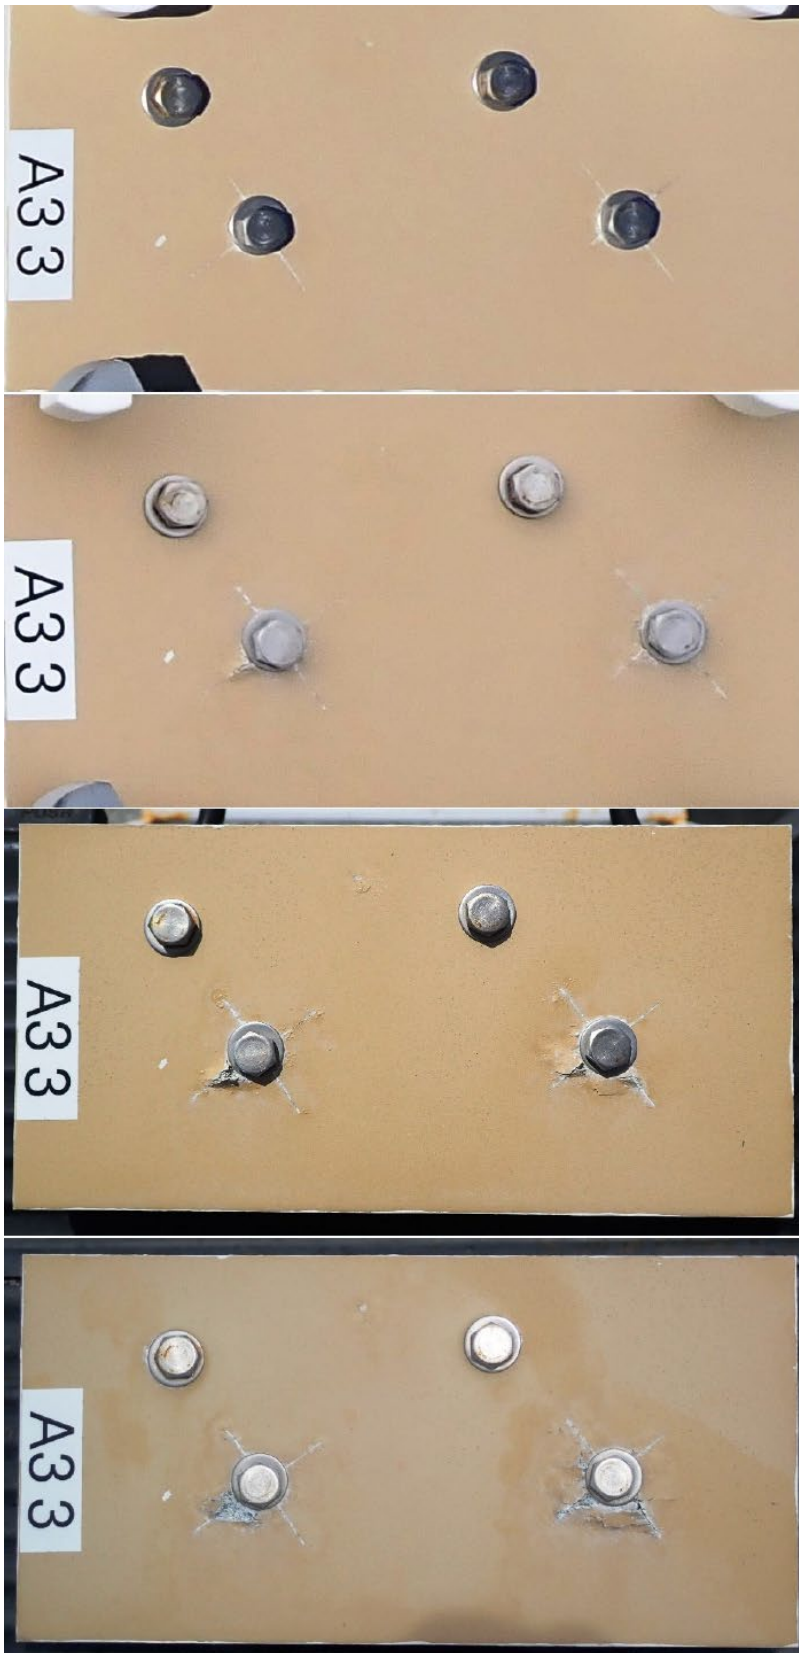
Panel A3-3 top-bottom: 3-, 6-, 9-, and 12-month inspection images
